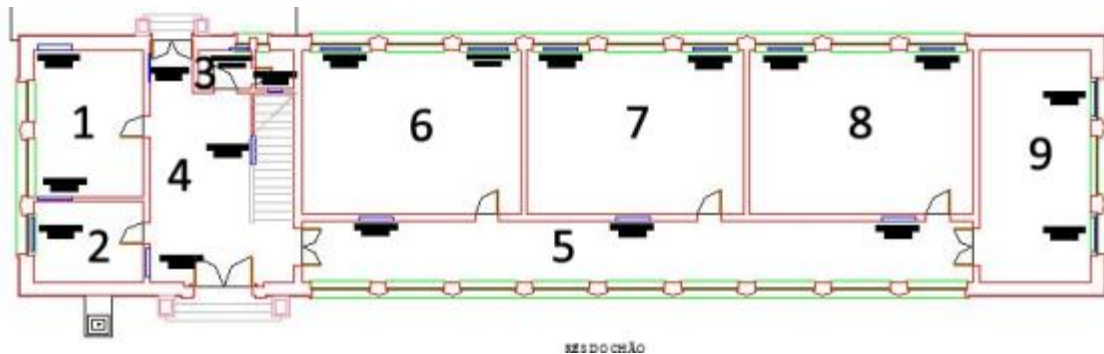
ROOMS USE IN BLOCK 1, FLOOR 0
